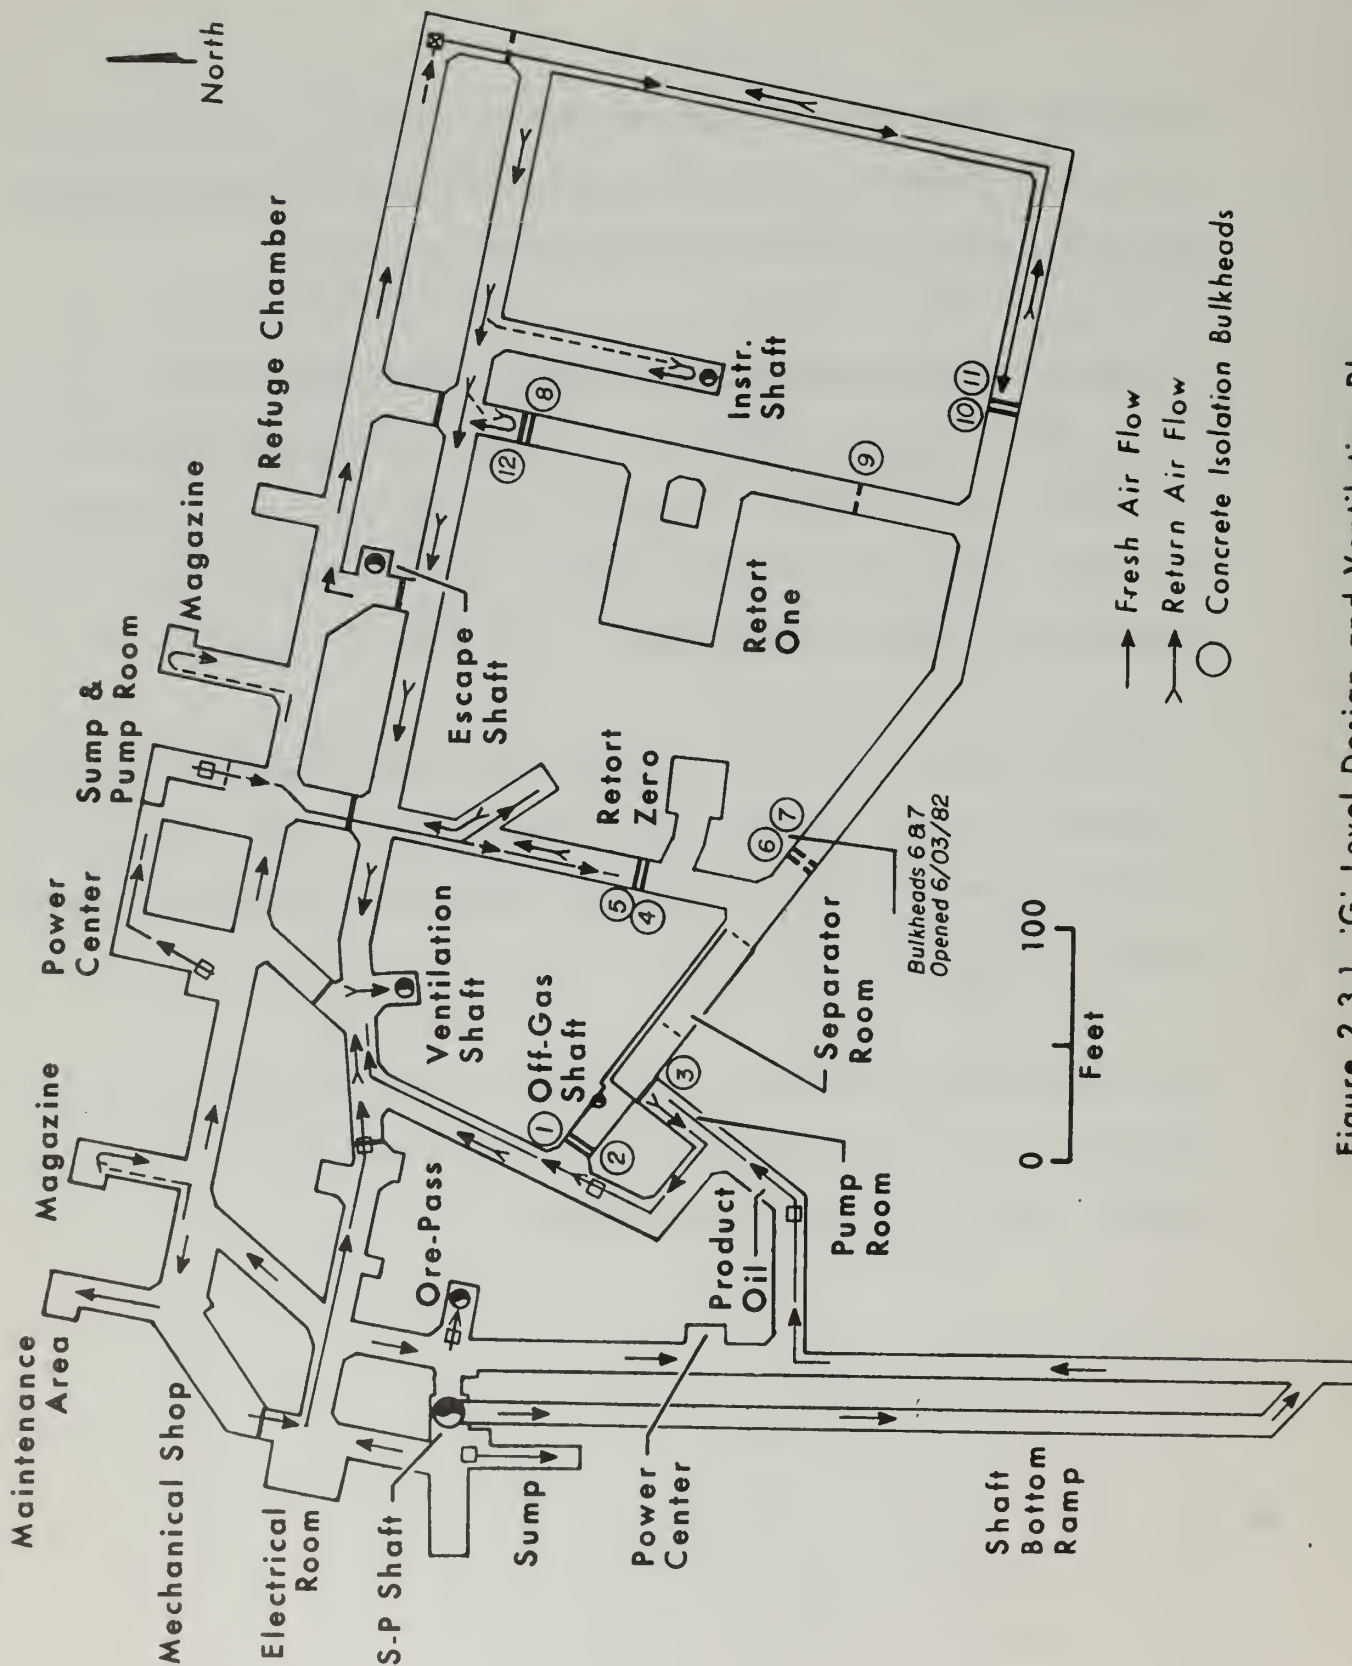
'G' Level Design and Ventilation Plan
